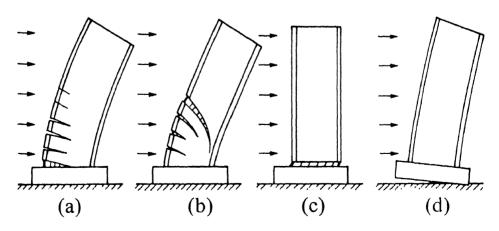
Failure modes of slender structural wall (a) Flexural failure (b) Shear failure (c) Sliding failure (d) Rotation of foundation (from Wakabayashi, M., 1986).
